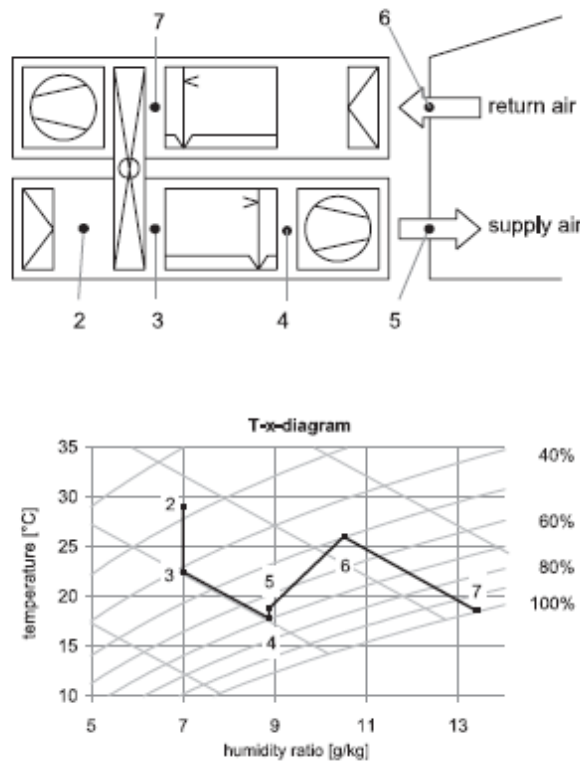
Schematic drawing of a combined evaporative cooling process
